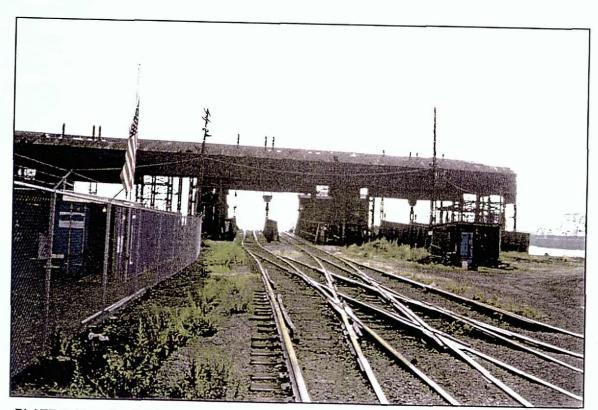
Transfer Bridge Structure and Extant Railroad Tracks Leading to the Transfer Bridges, Looking East
